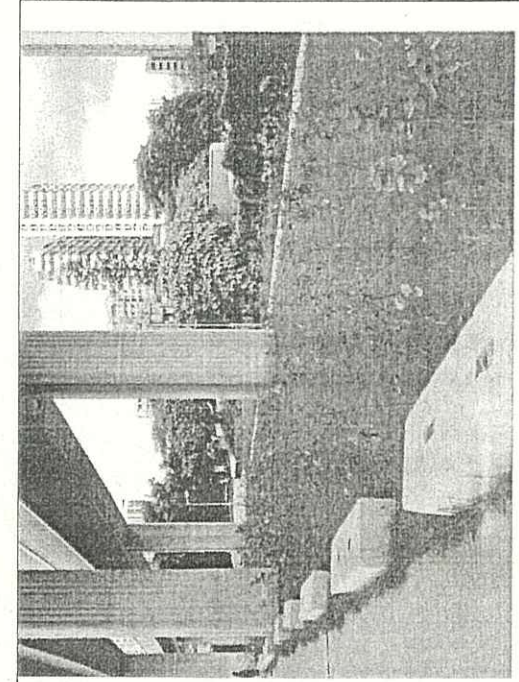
Completion of Seasonal Landscaping works at Yuen Long (Piers 607 - 613)
